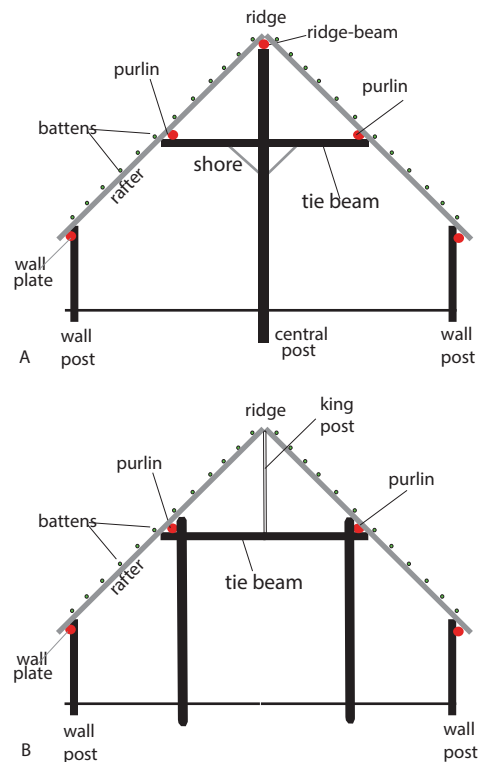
Structural elements of a house and their names A: a two-aisled construction; B: a three-aisled construction (drawing: H. Fokkens).
